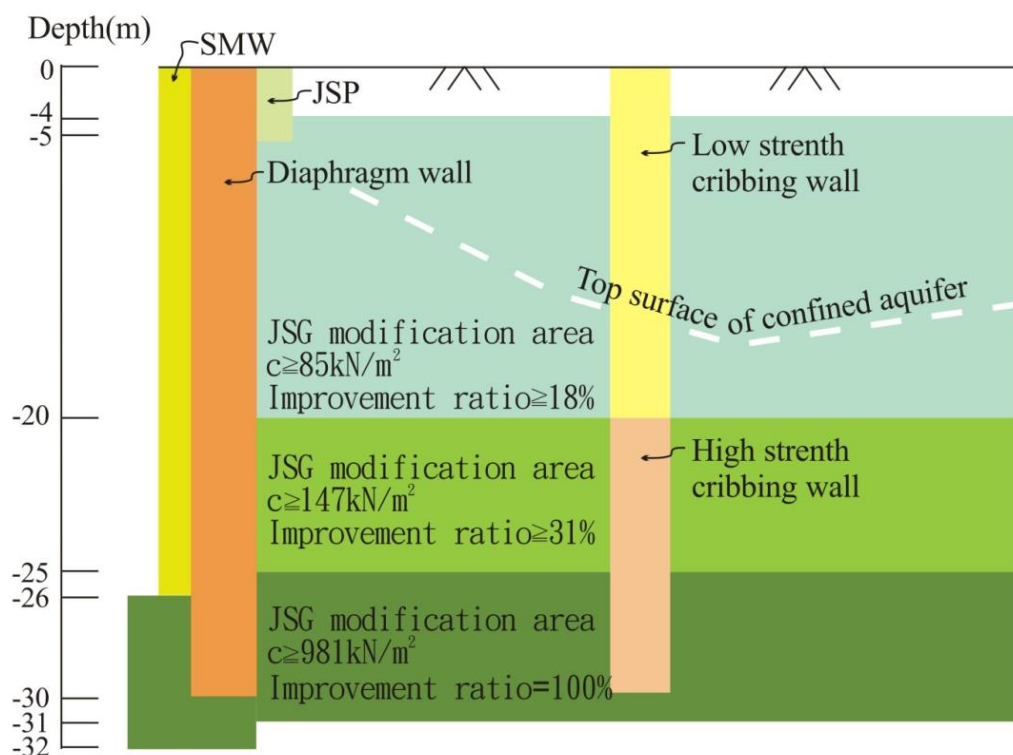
Section of ground modification after plan alterations (Ou and Hsieh, 2004)
